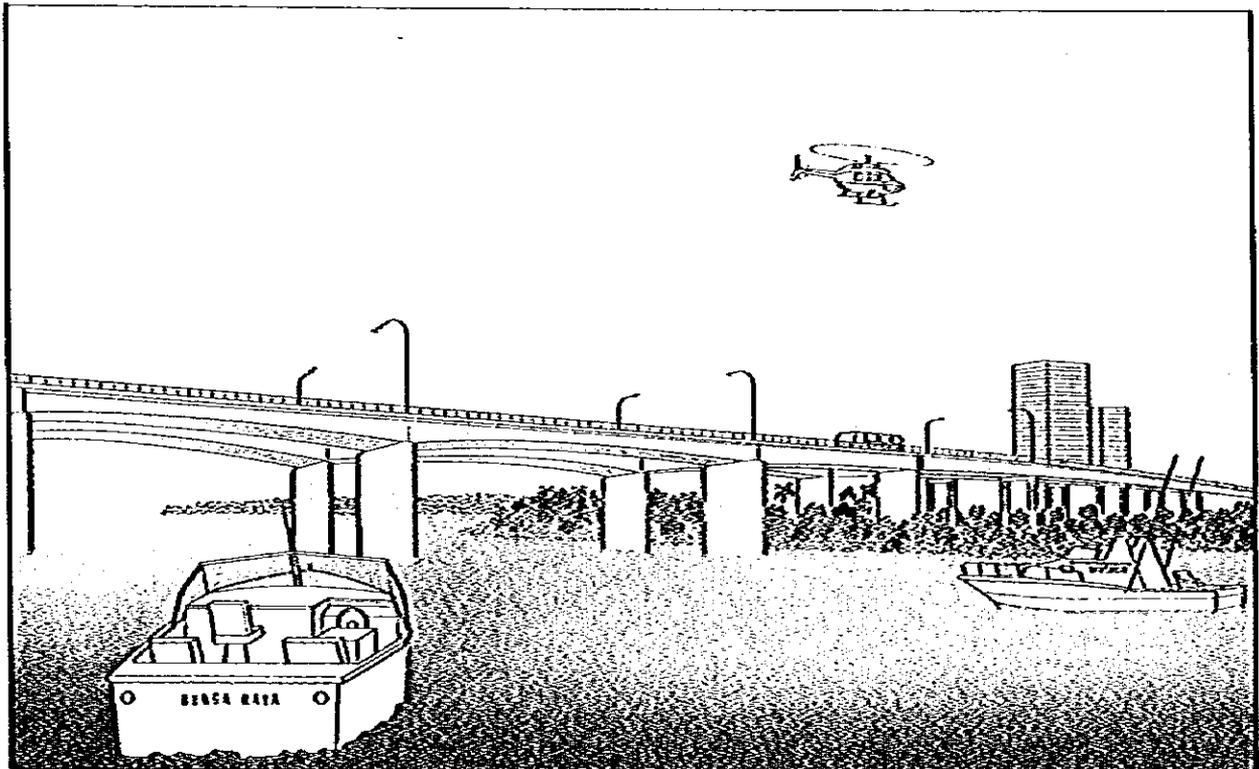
DESIGN IMAGE OF THE TEBRAU BRIDGE
